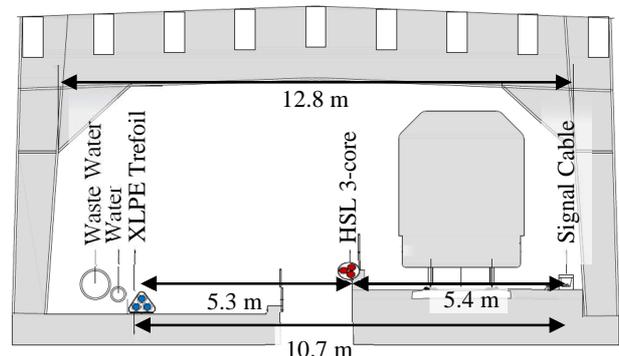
Steel cross section of the Britannia Bridge lower rail deck showing cable spacing and distance from signal cable.
